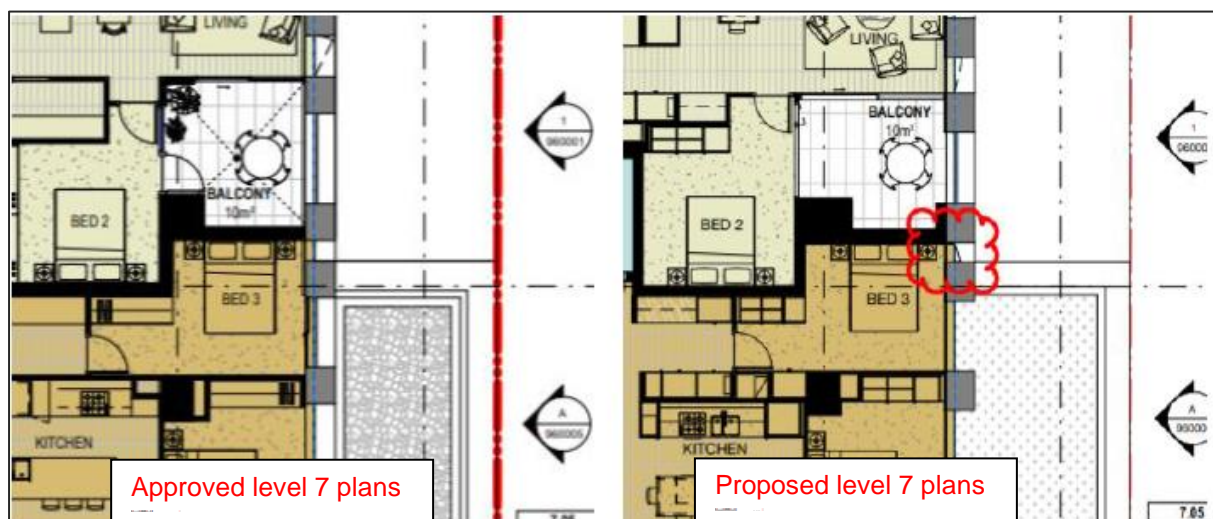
| Proposed additional window to level 7 of unit 7.05 (Source: Applicant's modification report)
